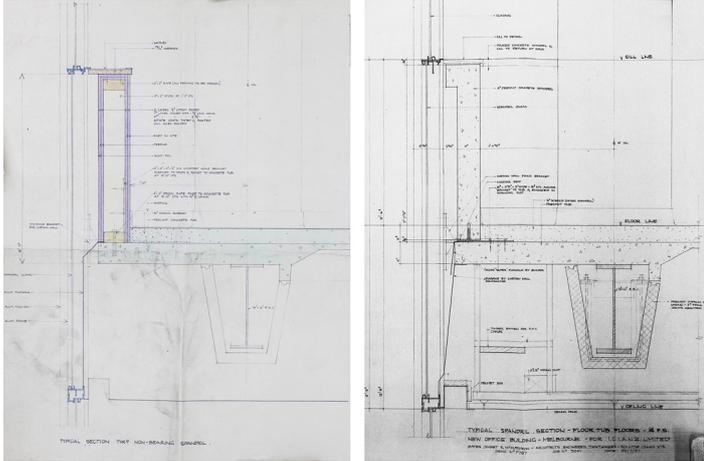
Bates, Smart & McCutcheon, ICI House, typical spandrel details showing alternative methods of fire-resistant construction. Left: light-weight stud wall detail, preliminary, dated 27 May 1957. Right: precast concrete upstand detail, as built, dated 29 July 1957. PROV, VPRS11200/P0007, Units 1350 and 1351, Building Application no. 30056.
